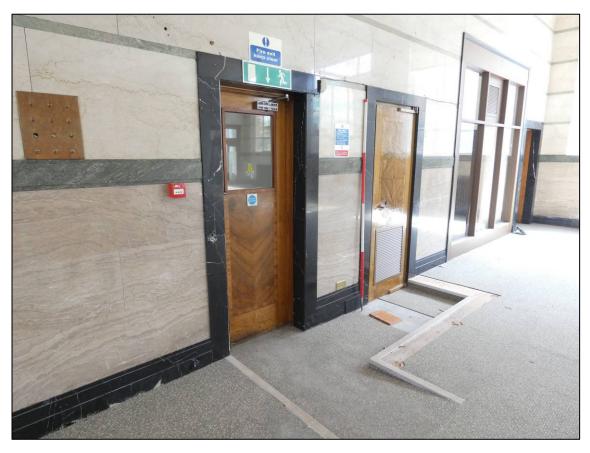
Banking hall and general office (GF2), south part of east wall, ramp to basement stairs (GF19) and strong room (GF12), looking SE (photo 857).
